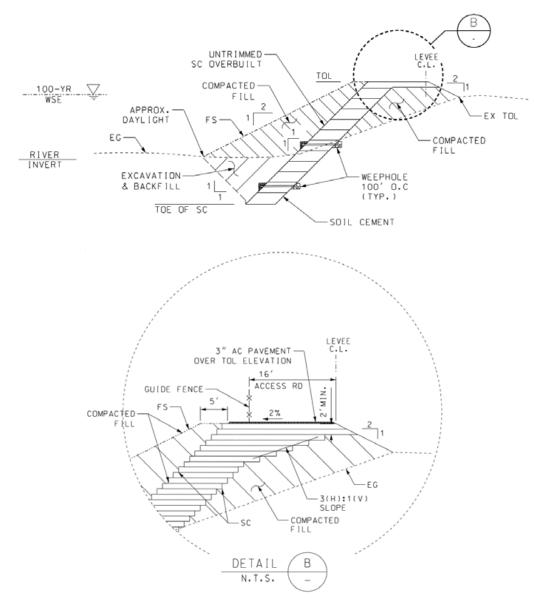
Typical Soil Cement Bank Protection along Tie-In Levee Alignment
